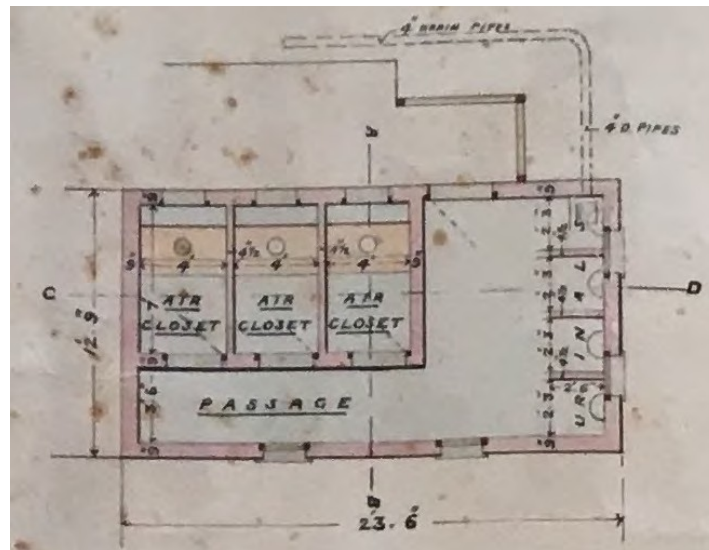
Original 1886 drawing of gentlemen's toilets. Source: QSA Series 17692 Plans of Queensland Railway Station Buildings etc., Item ID 120966.
